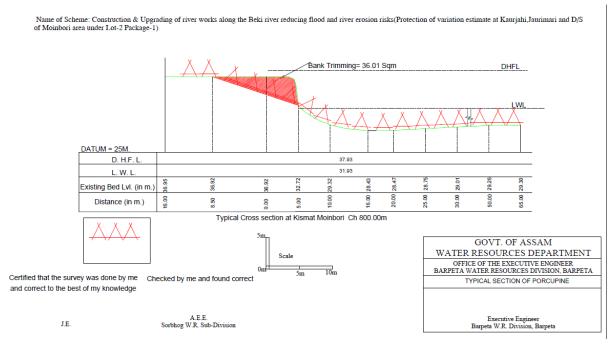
Typical Cross-Sections of Proposed Anti-Erosion Works
